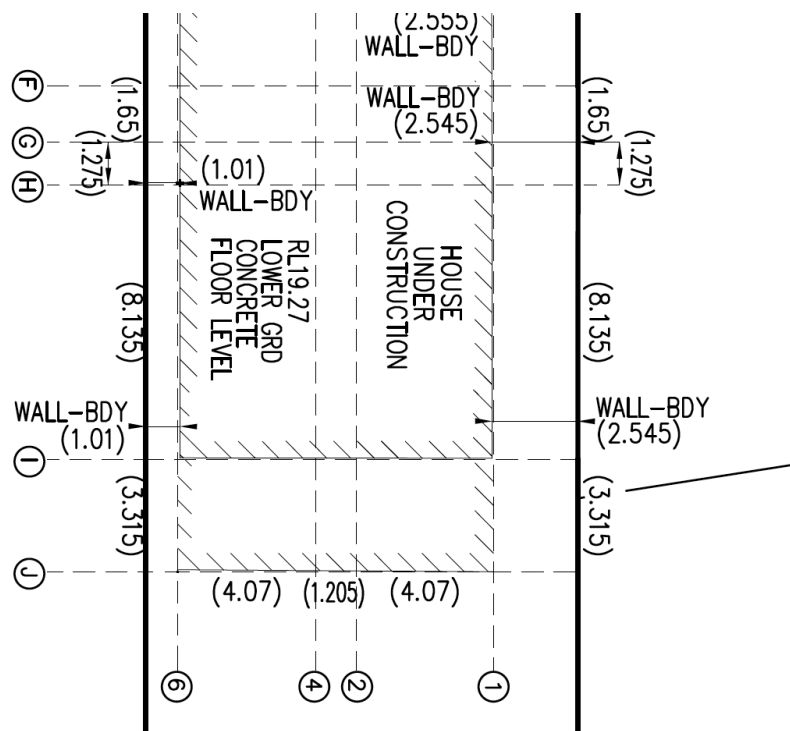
Grab of Survey Report (06.11.2024) noting the 1010mm measurement between the True Side Boundary to the constructed Structural wall & slab on site.
